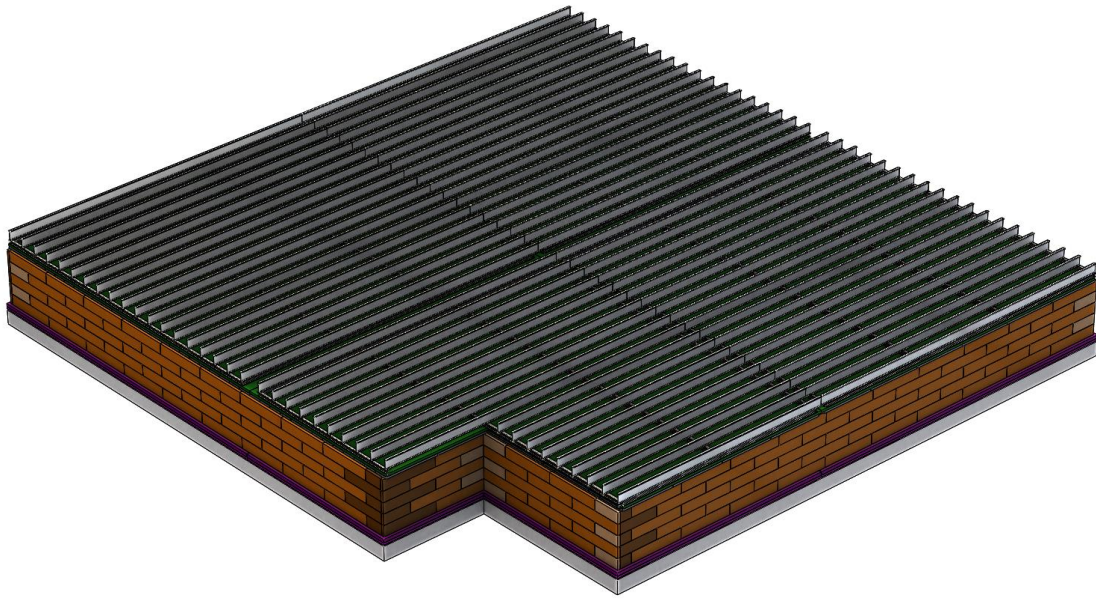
Transformation of the Storage Facility (building 158) into the Repository: general view of the metal support structure supporting 5.8 m thick engineering barrier [10]
